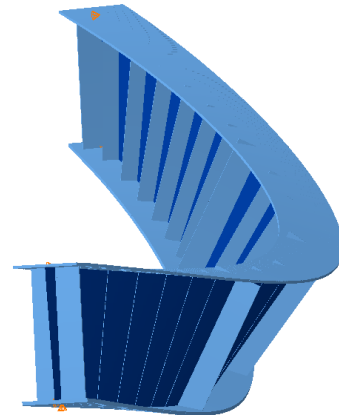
NISS54, Girder layovers under total dead load for NLF detailing.
